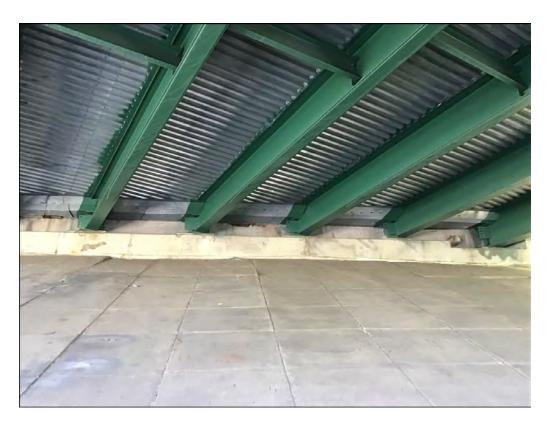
Kenilworth Avenue North (140011) - Looking at northeast abutment.
